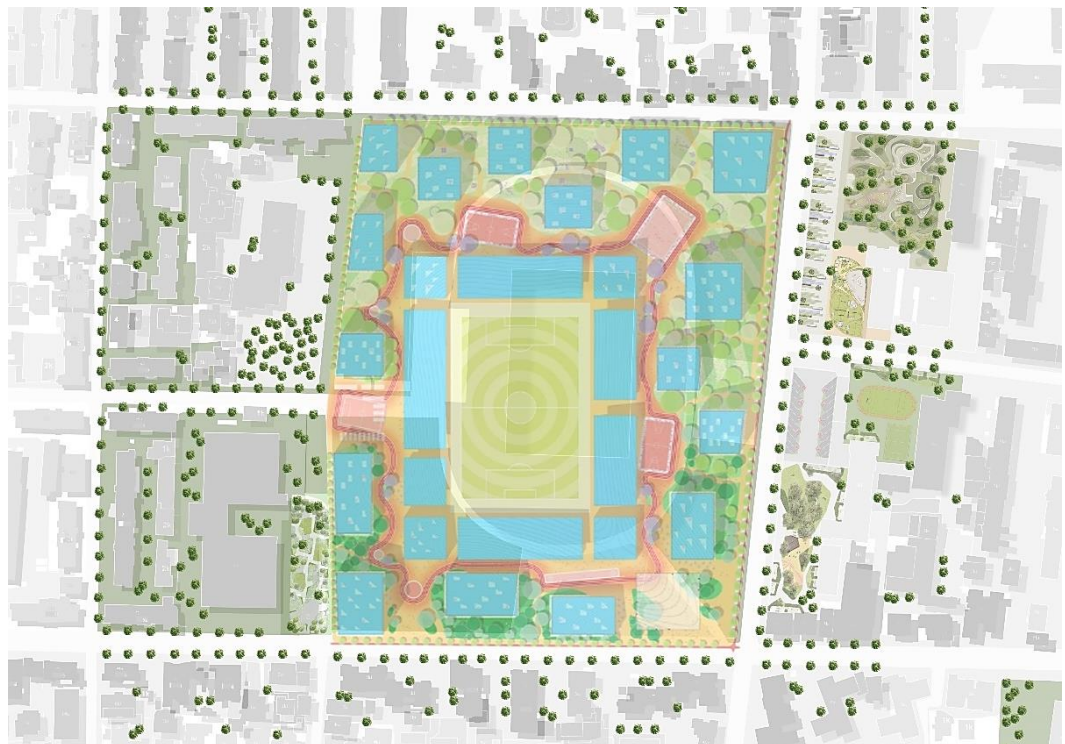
New Design Plan Proposal from Belgian studio 51N4E
